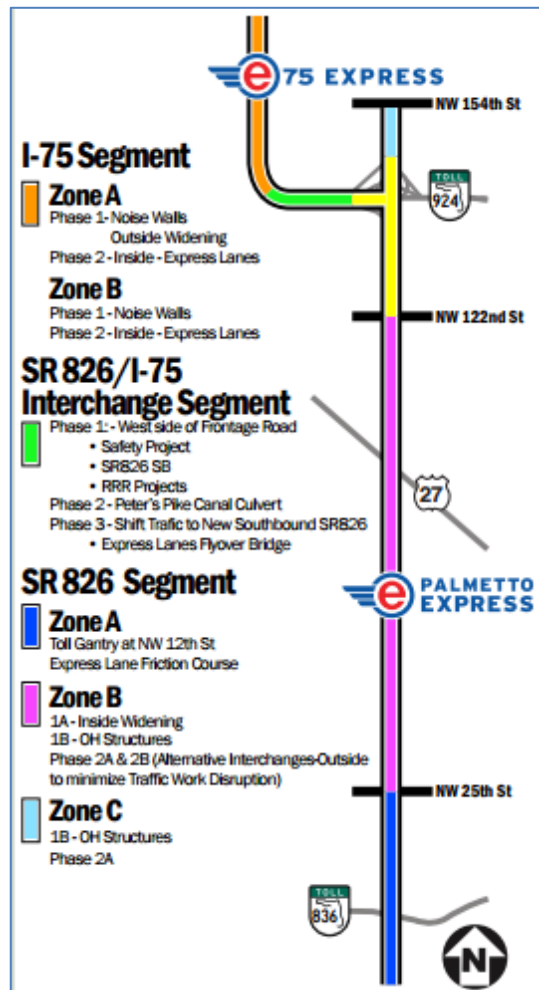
1 Construction Phasing and Traffic Management Plan Minimizes Disruption to Public
